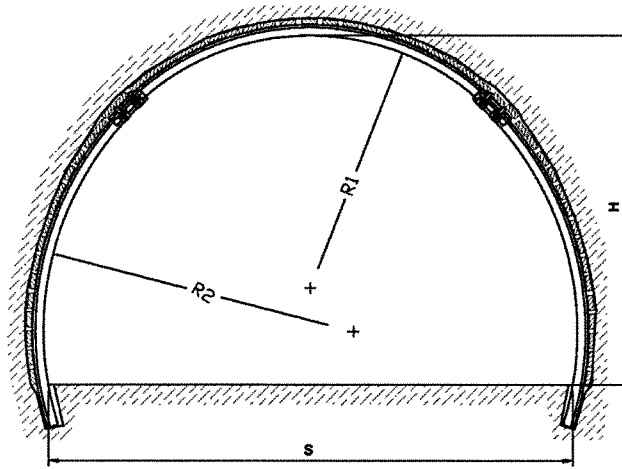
Cross-section and dimensions of development drift supported with yielding steel arches
